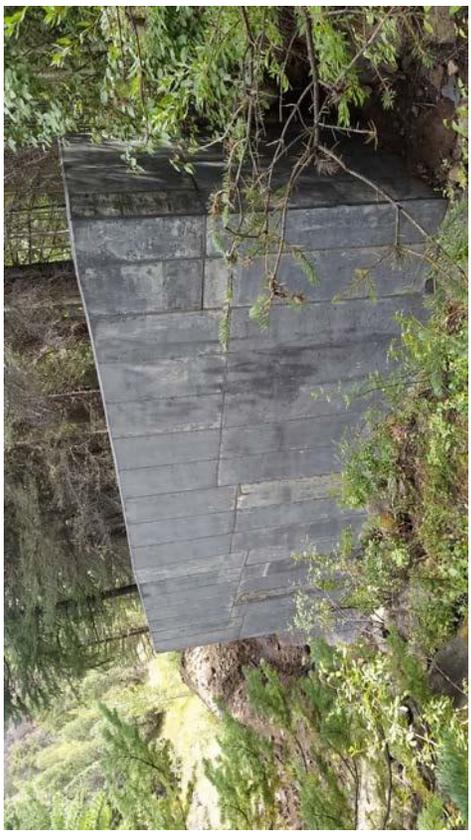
MEMORIAL FLOOD CONTROL WALL
